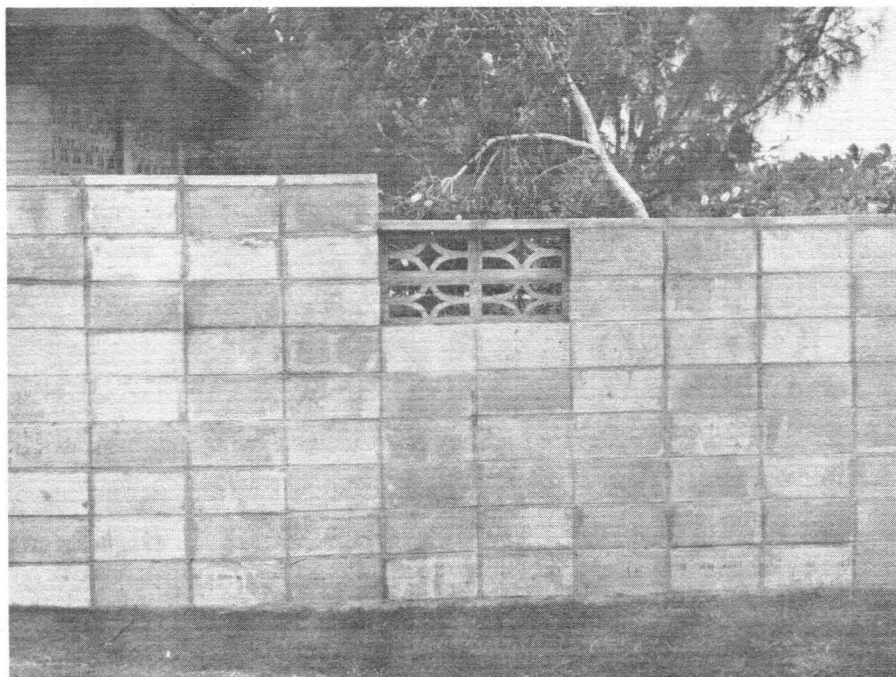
Masonry is used primarily to provide privacy, wind protection and noise control around homes. Generally it has little porosity as this destroys its effectiveness in providing privacy. This type of construction is very expensive, but its value as a windbreak should not be overlooked.
